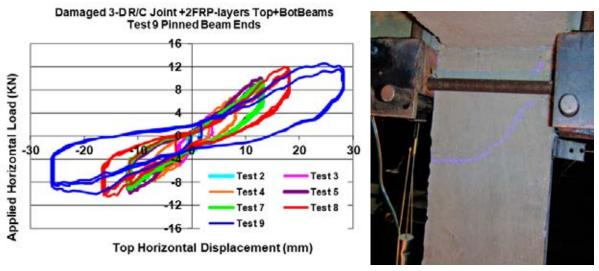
a) Cyclic load versus the corresponding horizontal dislacement response of the RC beam-to-column joint with FRP strengthened beams. b) observed cracking at the East beam cross-section
